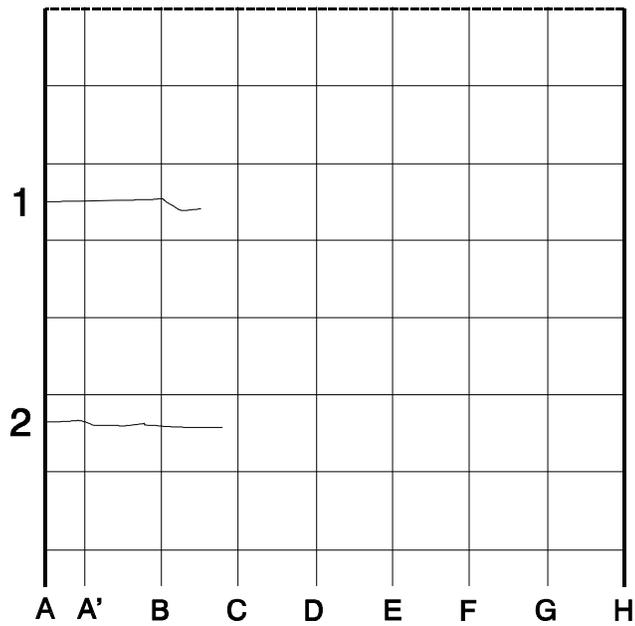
POJ-PU-74-TH cracking patterns on south face of joint at service load
